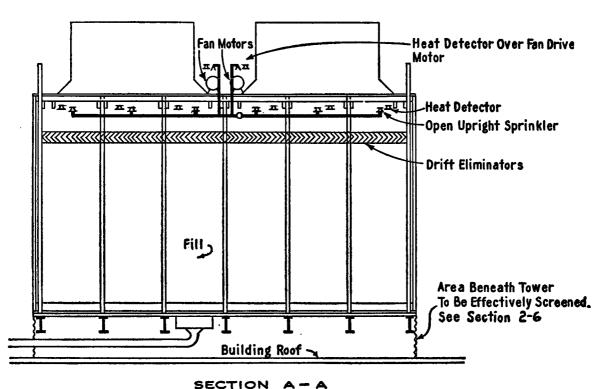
Typical deluge fire protection arrangement for counterflow towers.
